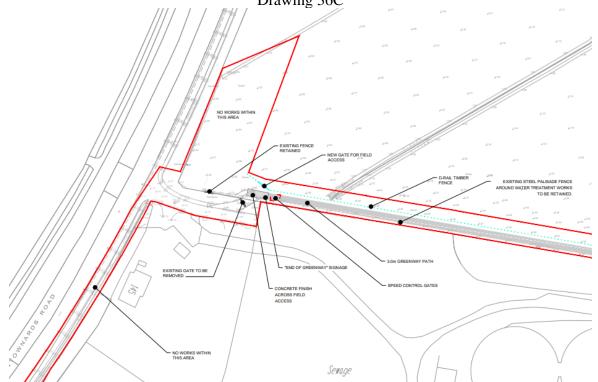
Amended plan showing the proposed start of the Newtownards section of the route. Drawing 80B.
